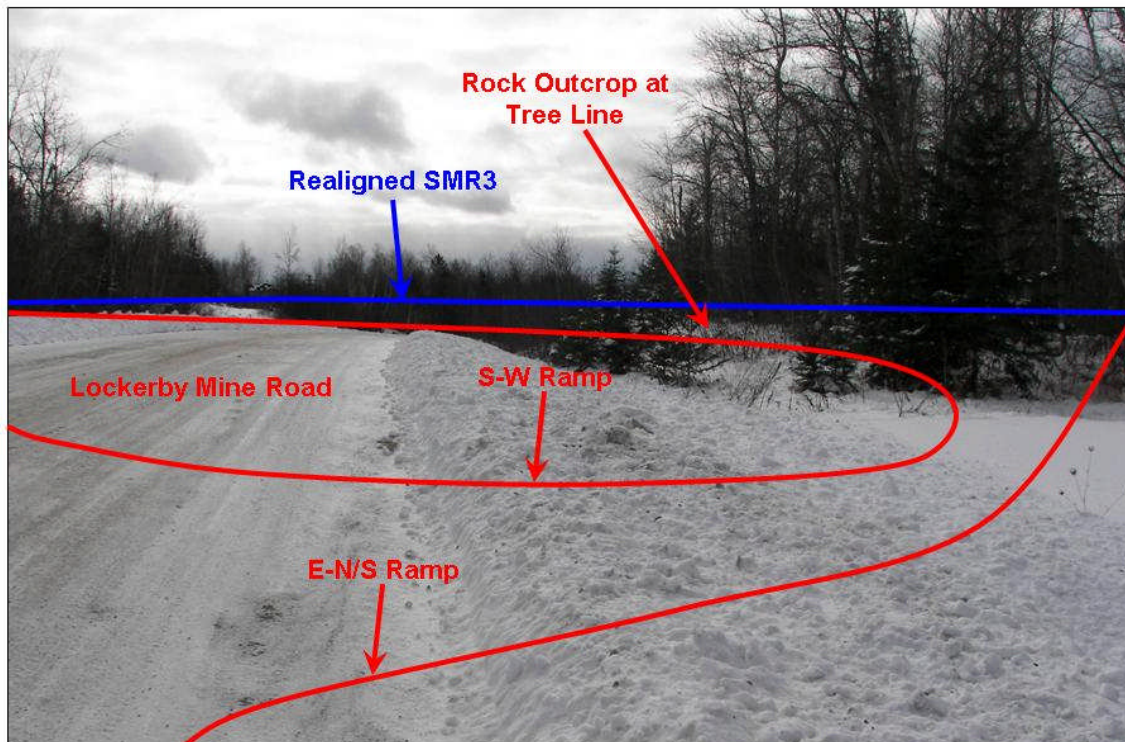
VIEW: Looking north from north shoulder of Lockerby Mine Road about 600 m east of intersection of existing SMR3. The Realigned SMR55 crosses the existing Lockerby Mine Road about 150 m to the west. The ground raises sharply to north. Shallow bedrock anticipated. Bedrock exposed in north ditch line at numerous locations to the west. (Dec. 6, 2007)
